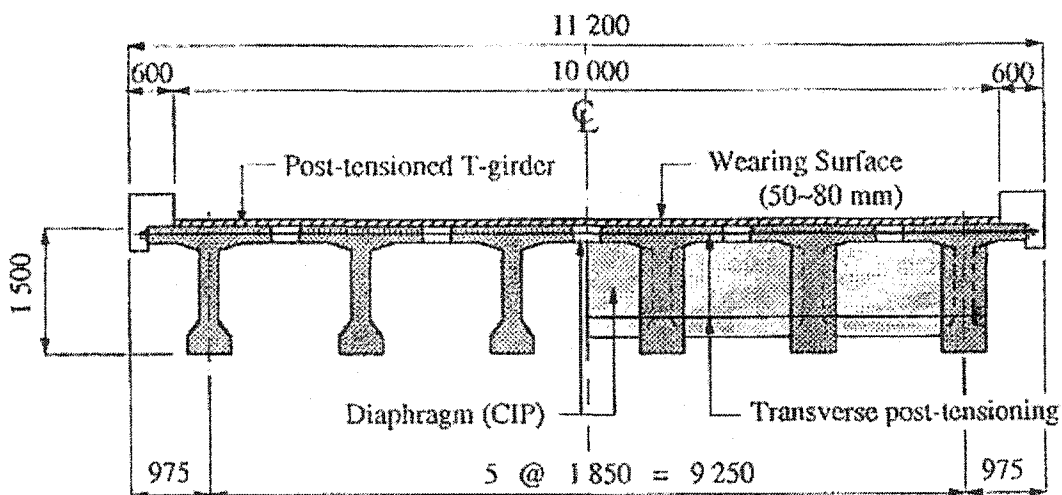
⁷: Cross Section of T Girder Bridges used for medium spans in Japan
